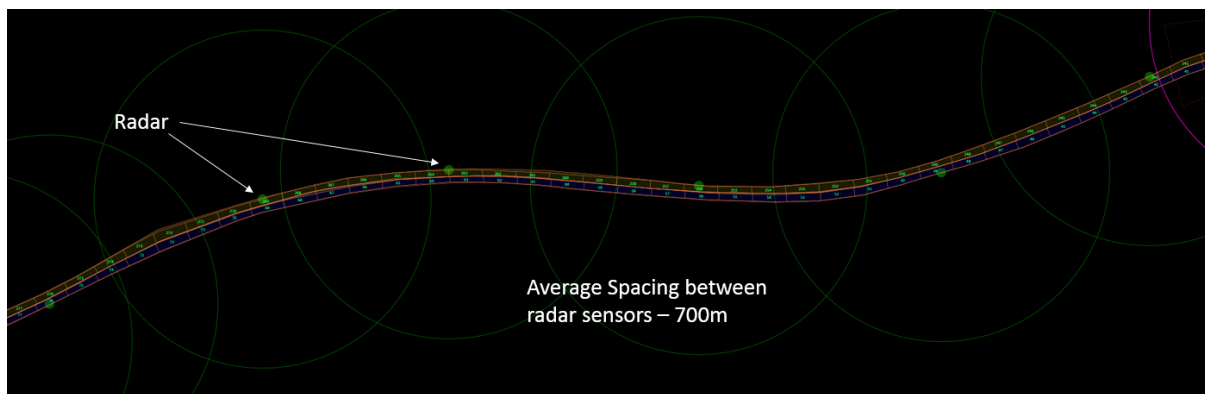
Typical Fixed Infrastructure Installation on a section of Smart Motorway
